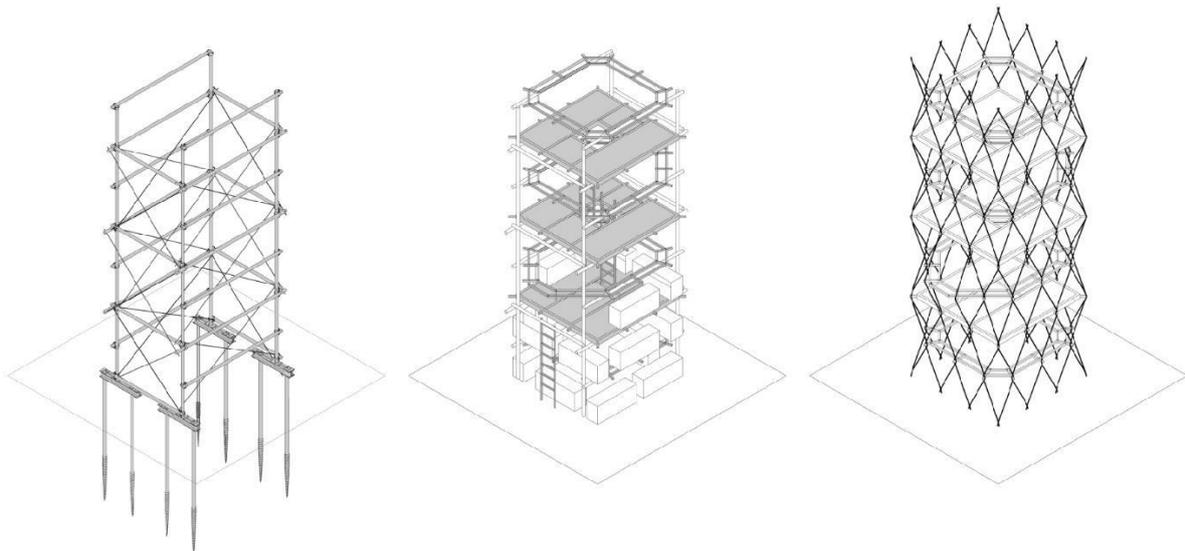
Construction process. Temporary scaffolding(left), plant containers and ingrowing elements(middle) and plant structure (right) (Ludwig, 2014)
